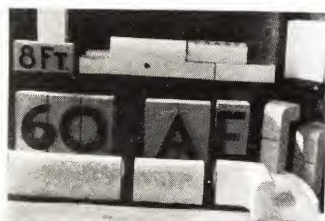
Special shapes of glazed brick used in swimming pool construction.
